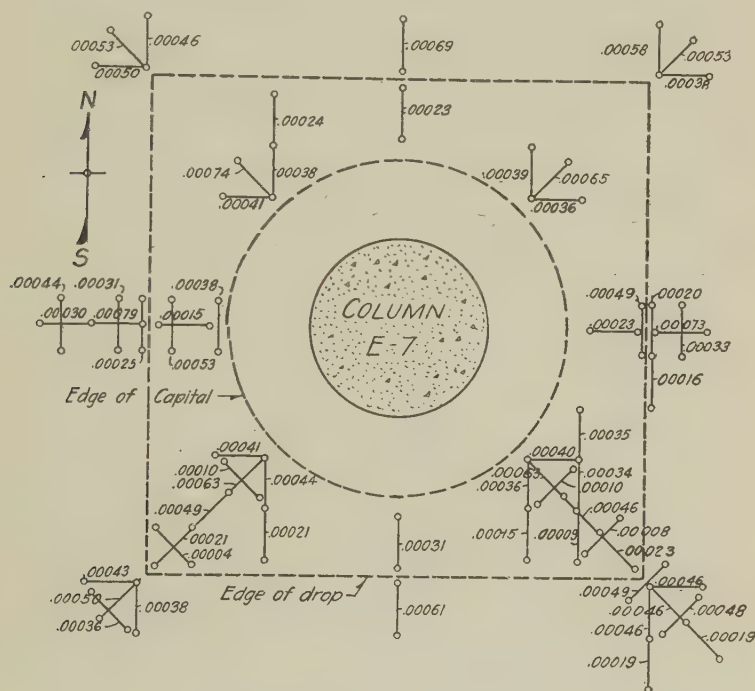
COMPRESSIVE UNIT IN SLAB AROUND CENTER COLUMN.
